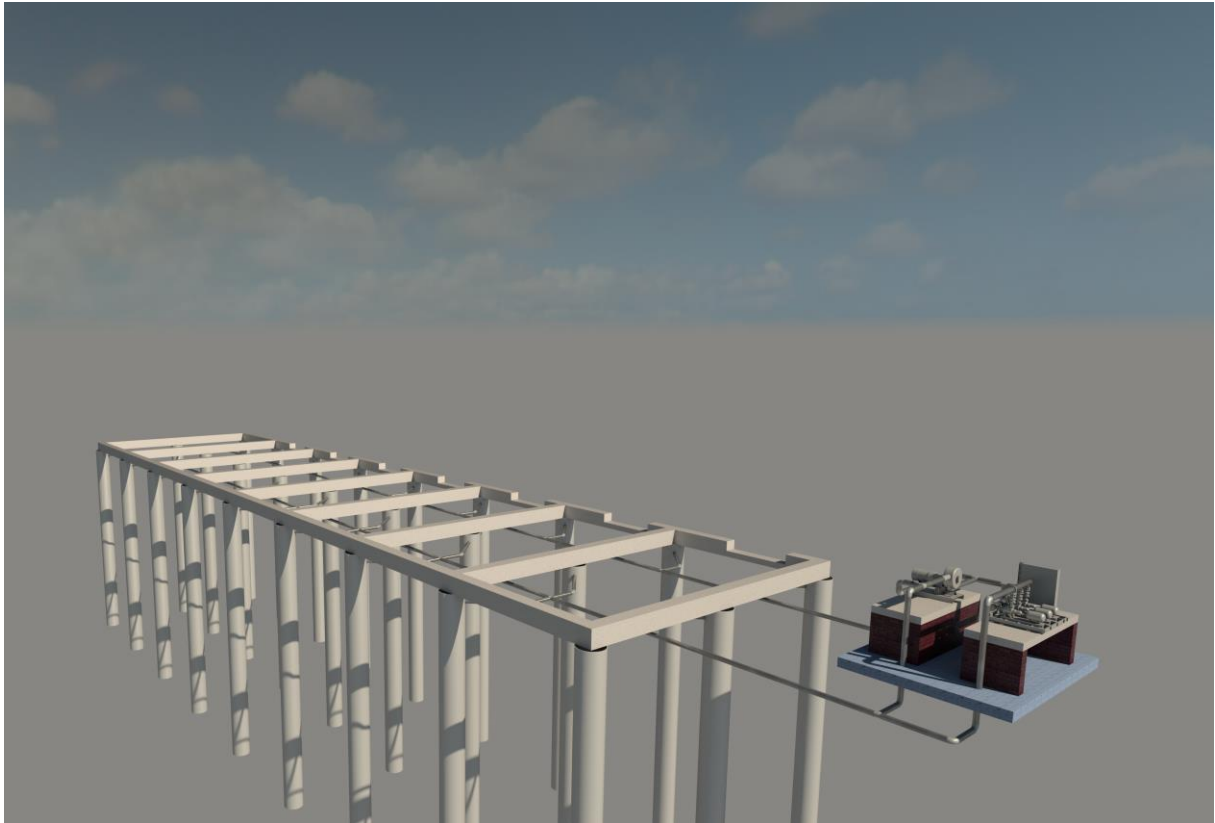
Impression of the LHERS system without the houses on top. The steel piles, foundation beams, pipelines and the technical room are shown
